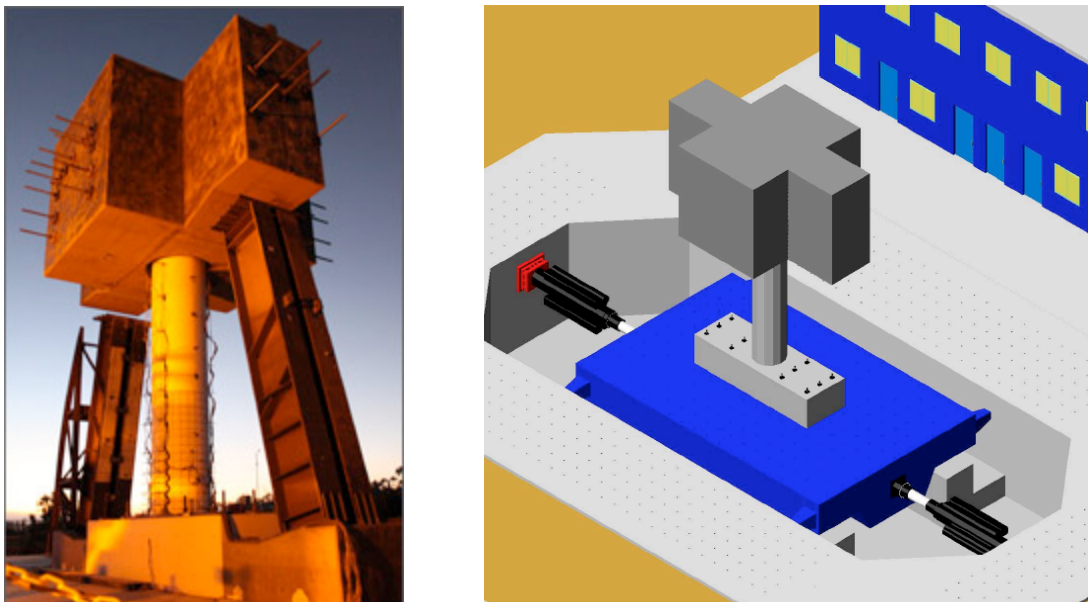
Full-scale reinforced concrete bridge column tested on the NEES Large High-Performance Outdoor Shake Table at UCSD's Englekirk Structural Engineering Center [1].
